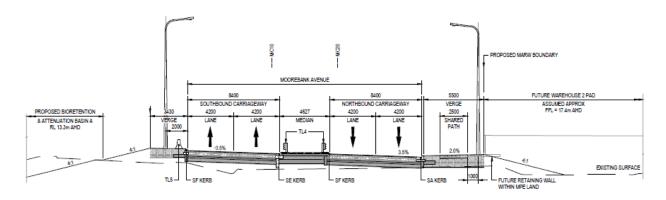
Indicative typical cross-section of alignment near north-east corner of MPE site
